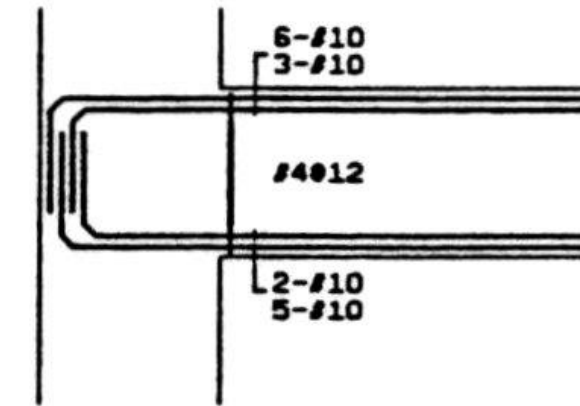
Corner joint reinforced with overlapping U-shaped bars
